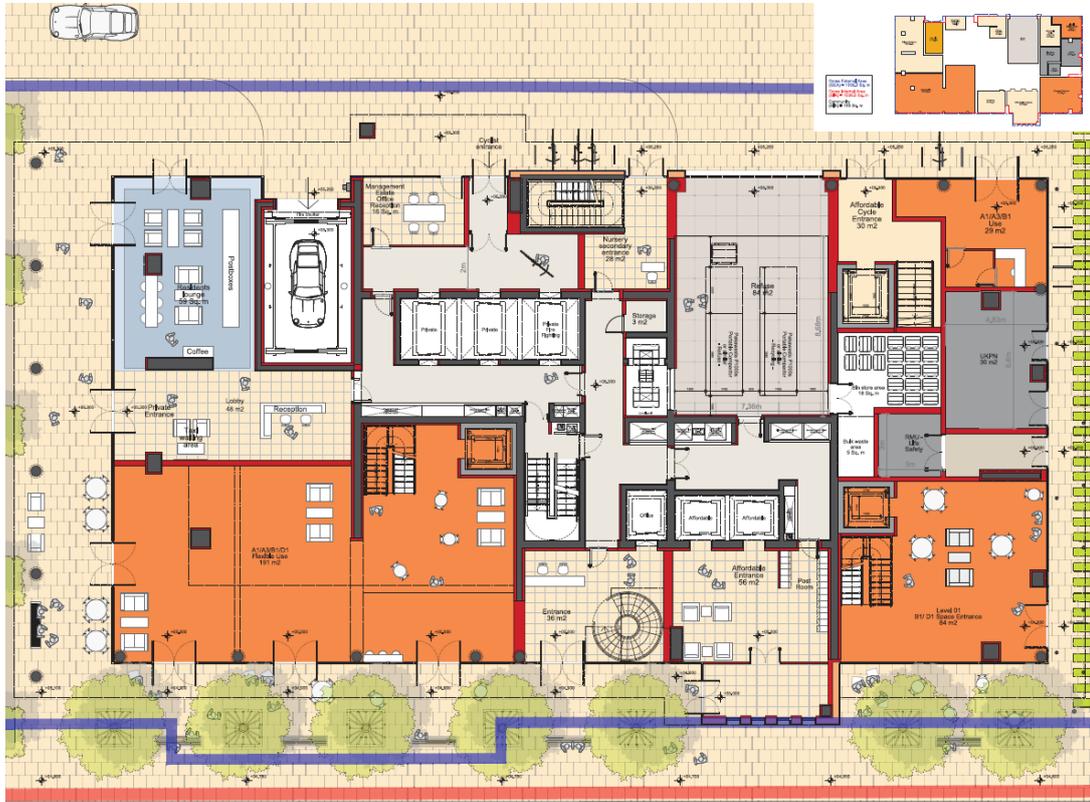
ground floor of previous scheme, planning reference PA/15/02303
